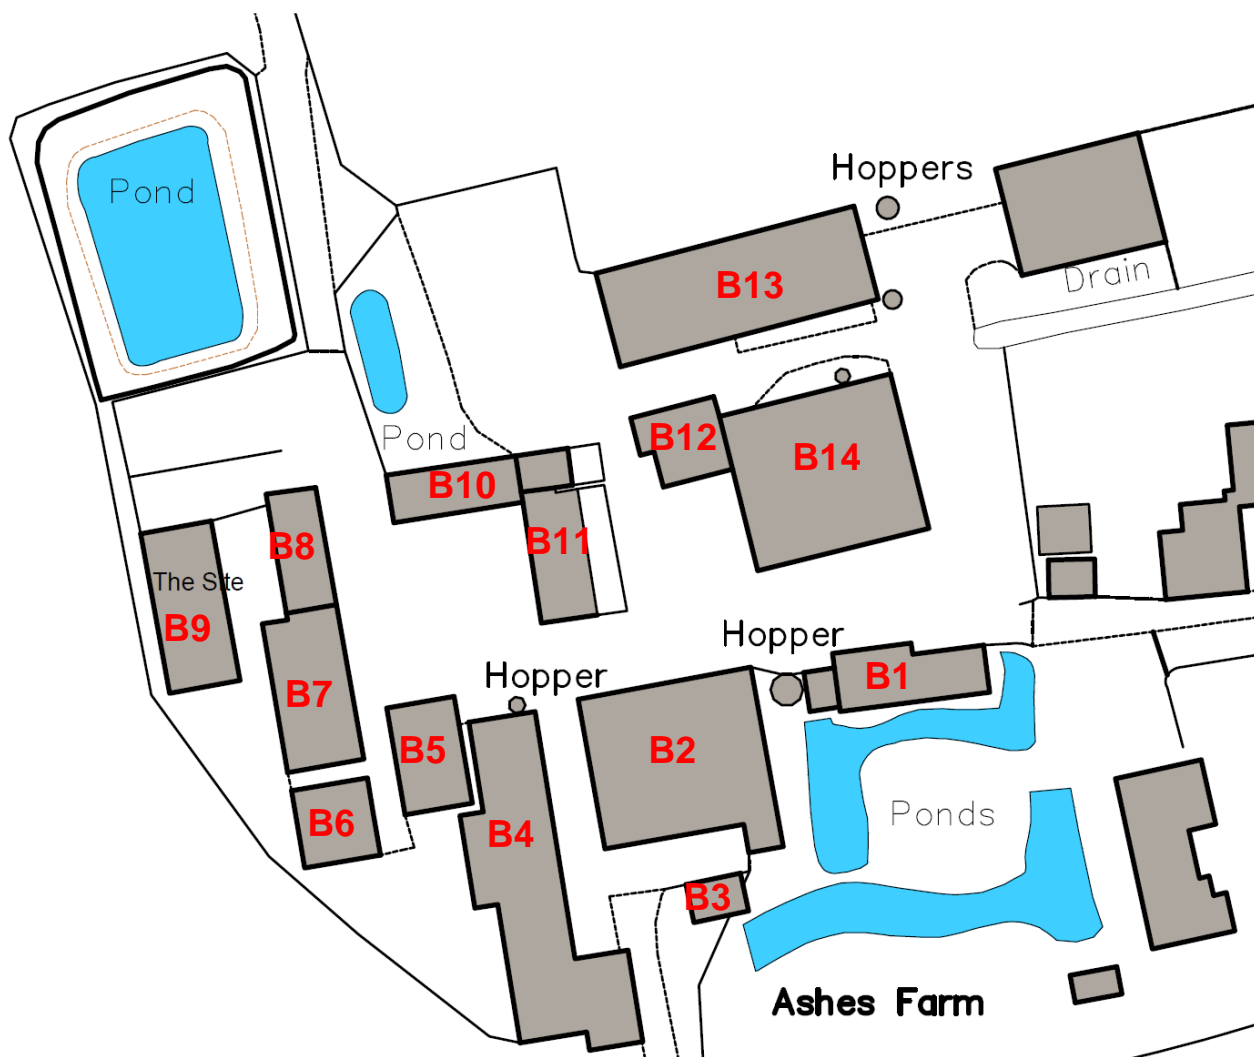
Building layout, taken from draft layout plan provided by Peter Wells Architects
